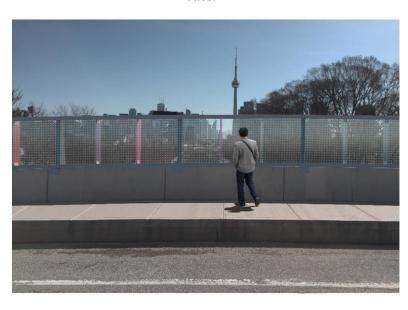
Illustrative Bridge Barrier Design Options (Examples)
